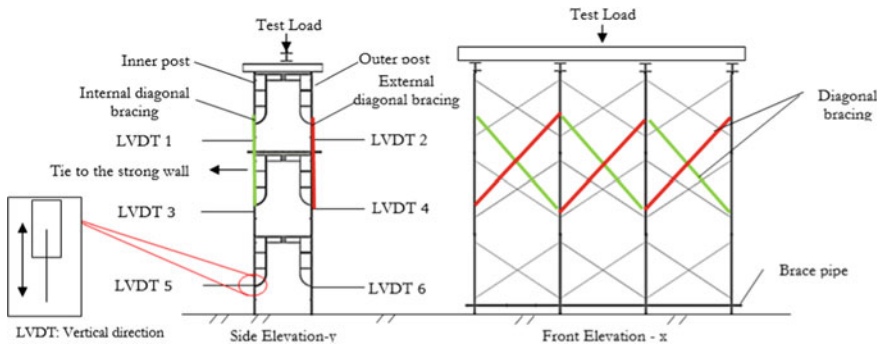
Test setup for load test on a 3-bay × 3 lift steel frame scaffolds falsework
